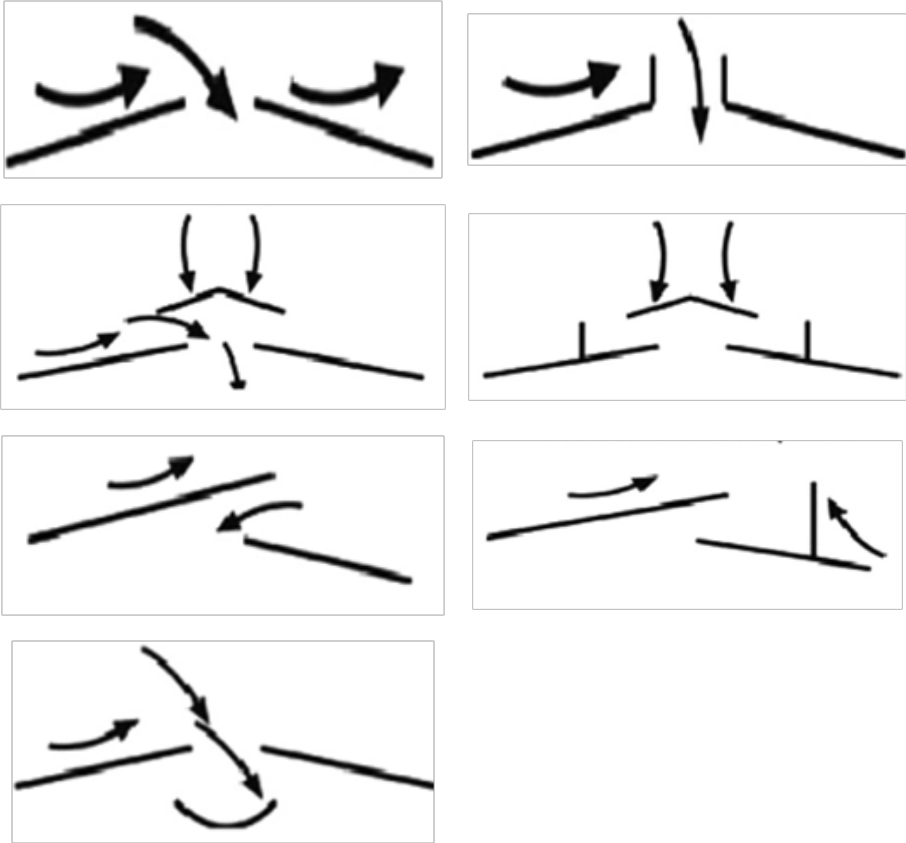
Ridge openings in roofs (Firfiris et al., 2019)
